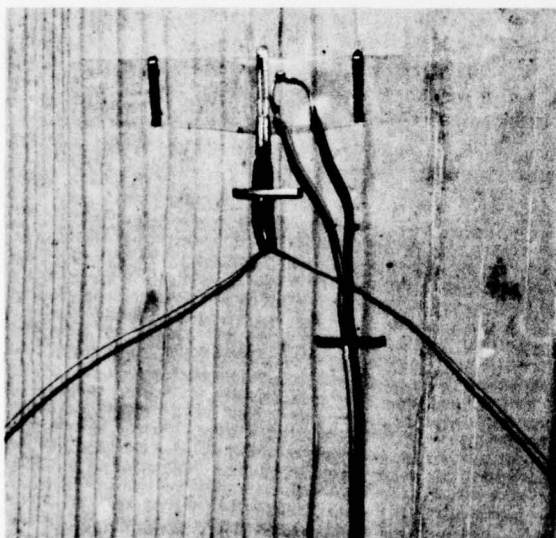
Moisture probe and thermocouple attached to interior surface of sheathing board.
